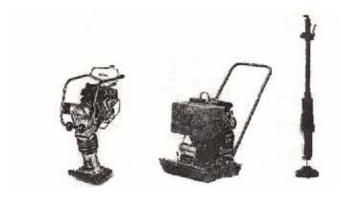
Compaction equipment from left to right: impact rammer, vibratory plate, and compressed-air tamper (Jayawickrama et al. 2000)
